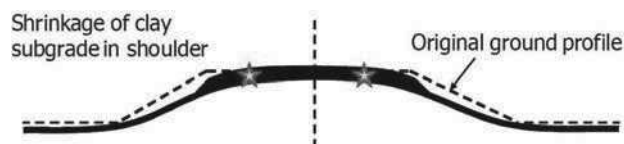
Mechanism of longitudinal crack development on pavement over expansive clays during dry season. (Modified from Zornberg, Gupta & Ferreira, 2010).
